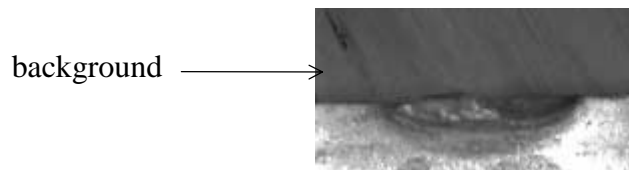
Shear failure of a fillet weld at the toe of DuraGal[®] angle
